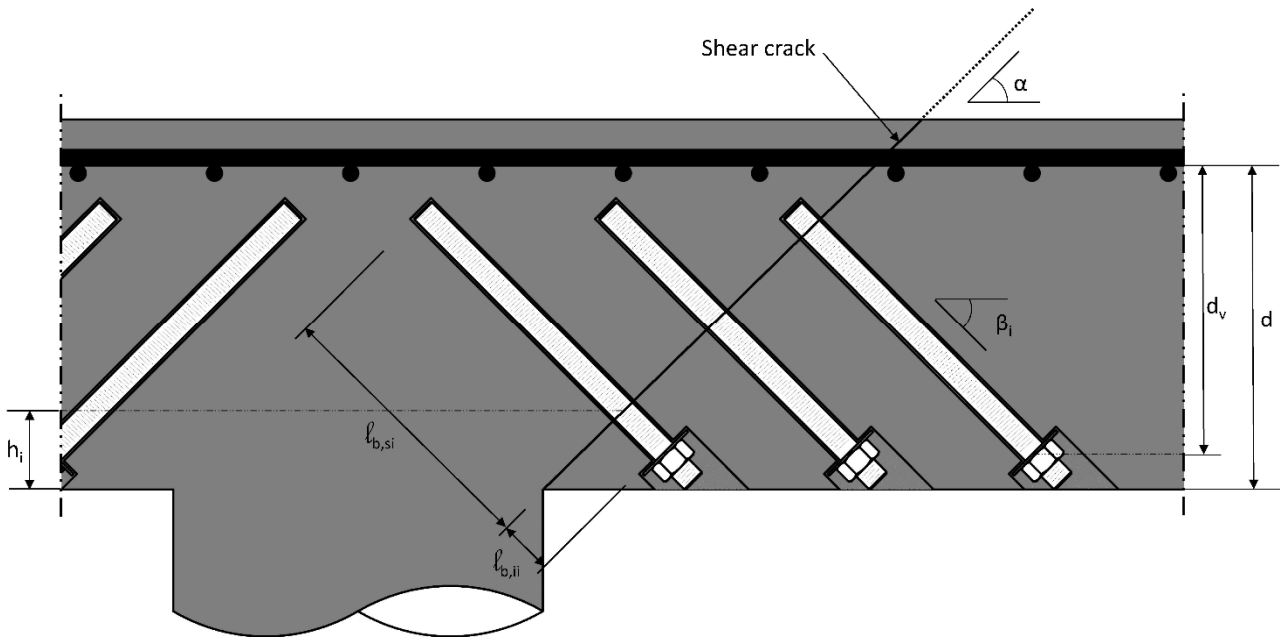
Control shear parameters of bonded shear reinforcement anchored by the slab bottom (adapted from Ruiz et al. [37])
